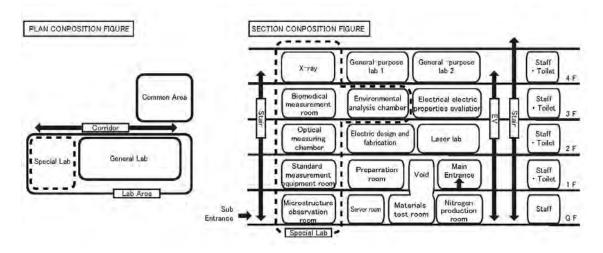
Common Measuring Equipment Building Basic Construction Diagram
